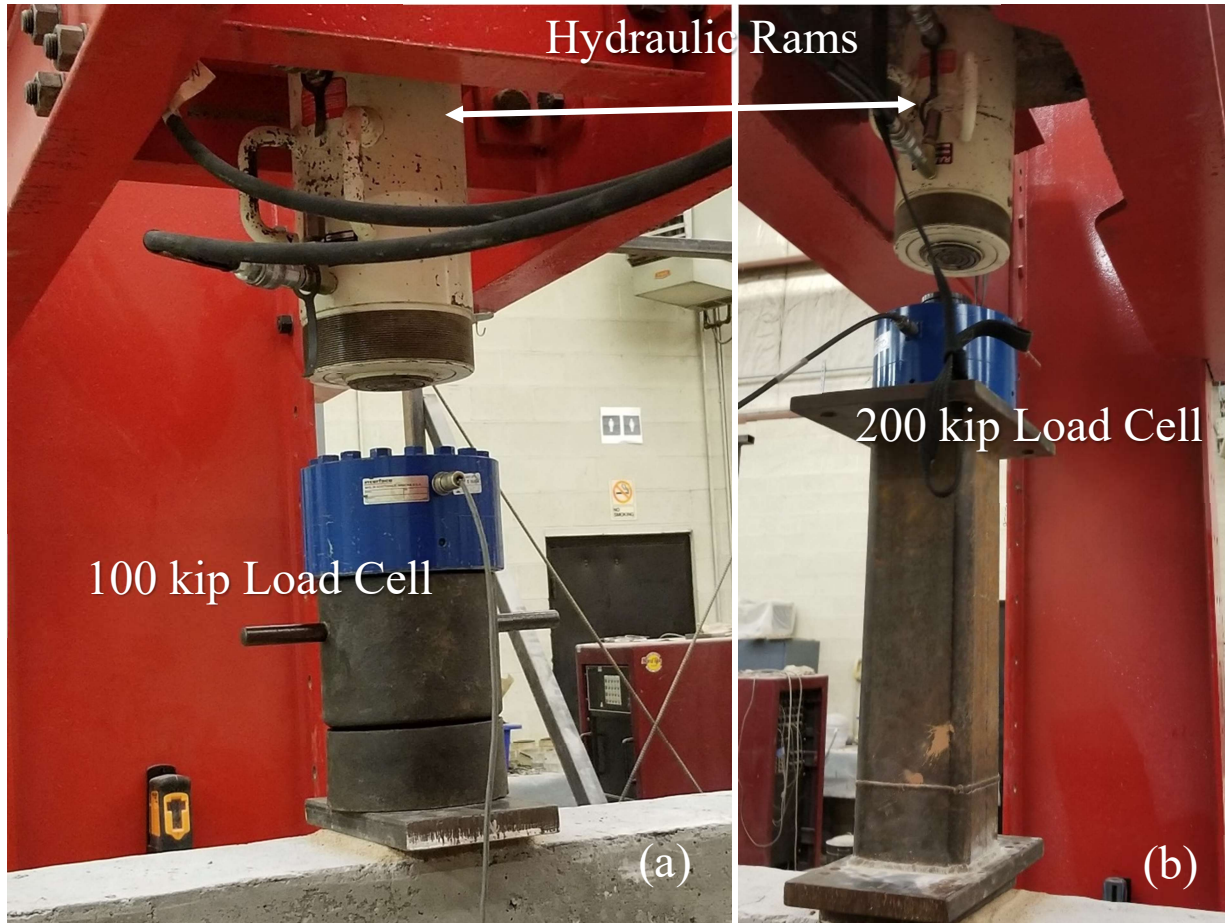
100 kip load cell and hydraulic ram on the North beam (a) and 200 kip load cell and hydraulic ram on South beam (b).
